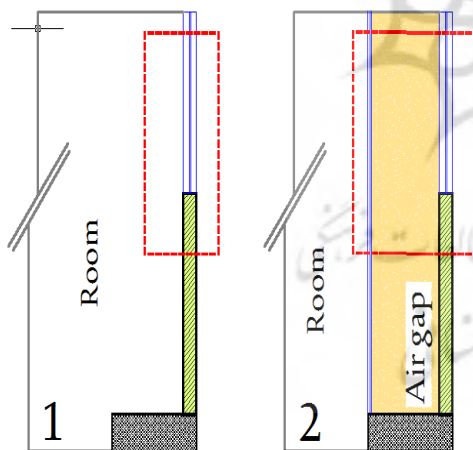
Part of the exterior wall section, without a greenhouse (1) and with greenhouse (2)
